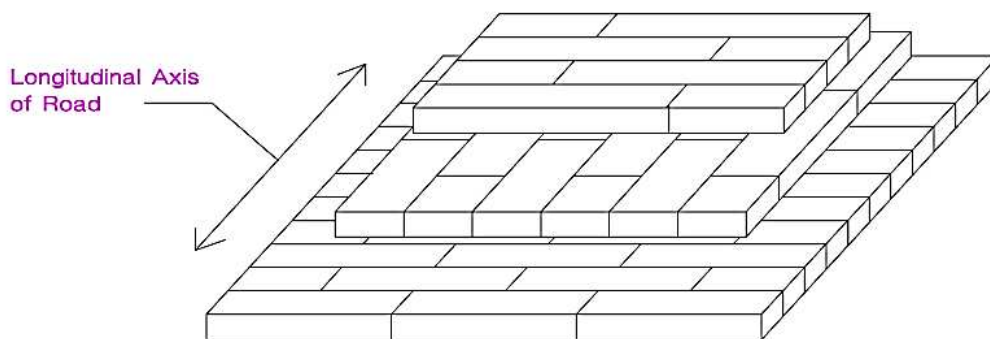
Isometric view of typical EPS blocks layout for a road embankment (Stark et al. 2004)
